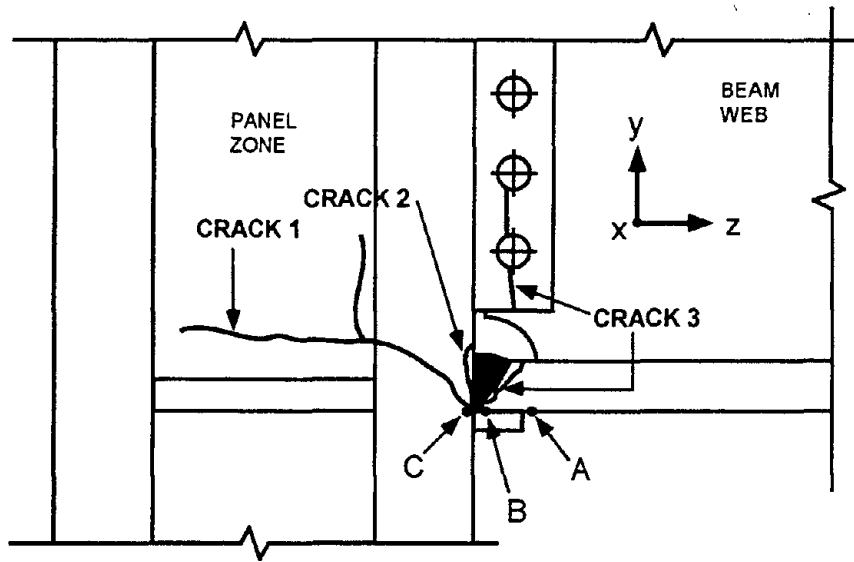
Critical points in the connection - point A on beam flange, point B on beam-weldment junction, and C at column flange.
